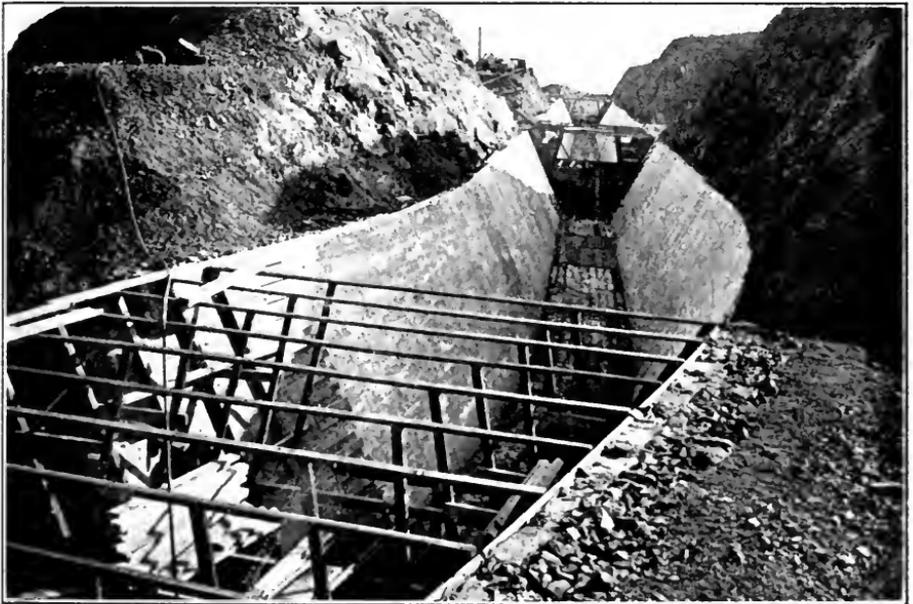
FIG. B.—Partly completed concrete-lined canal. Truckee Carson Project, Nev.
